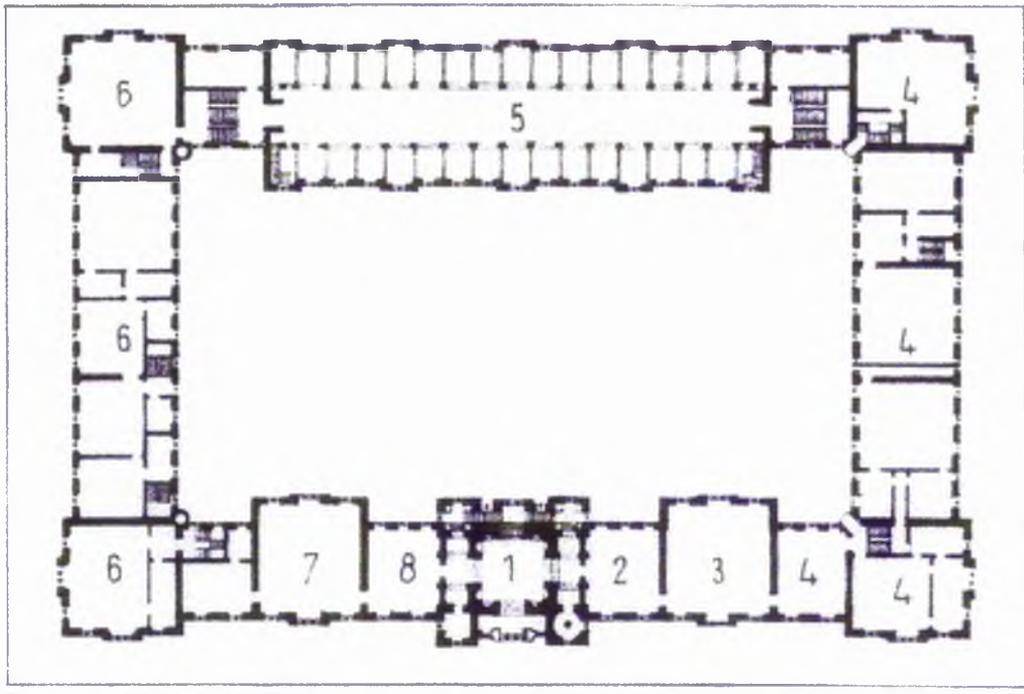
Glasgow University. Woodlands layout plan. J. Baird's second design undated. (Plan taken from drawing GUA 12728).
